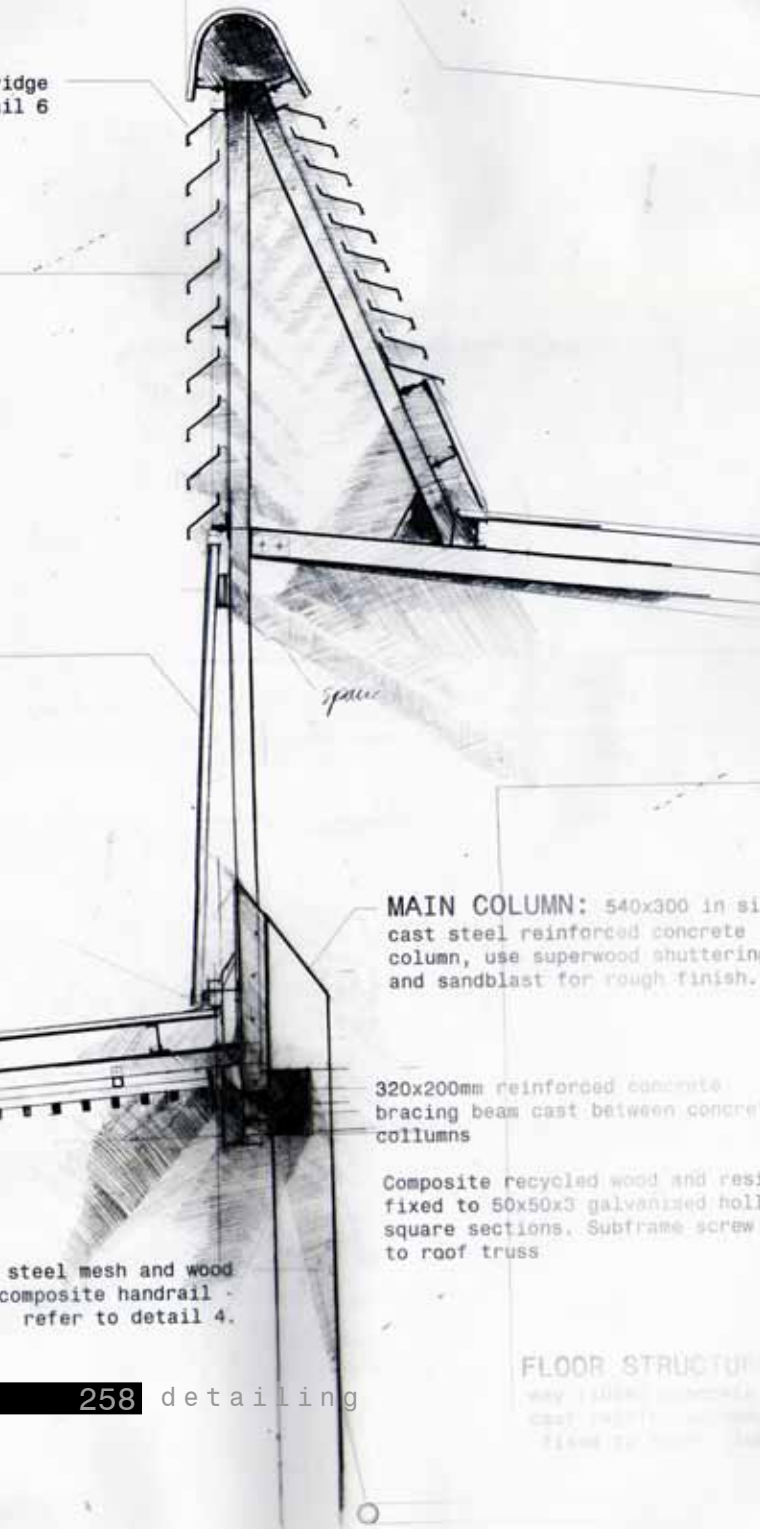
Conceptual development of steel column bracket [Source: Author]
